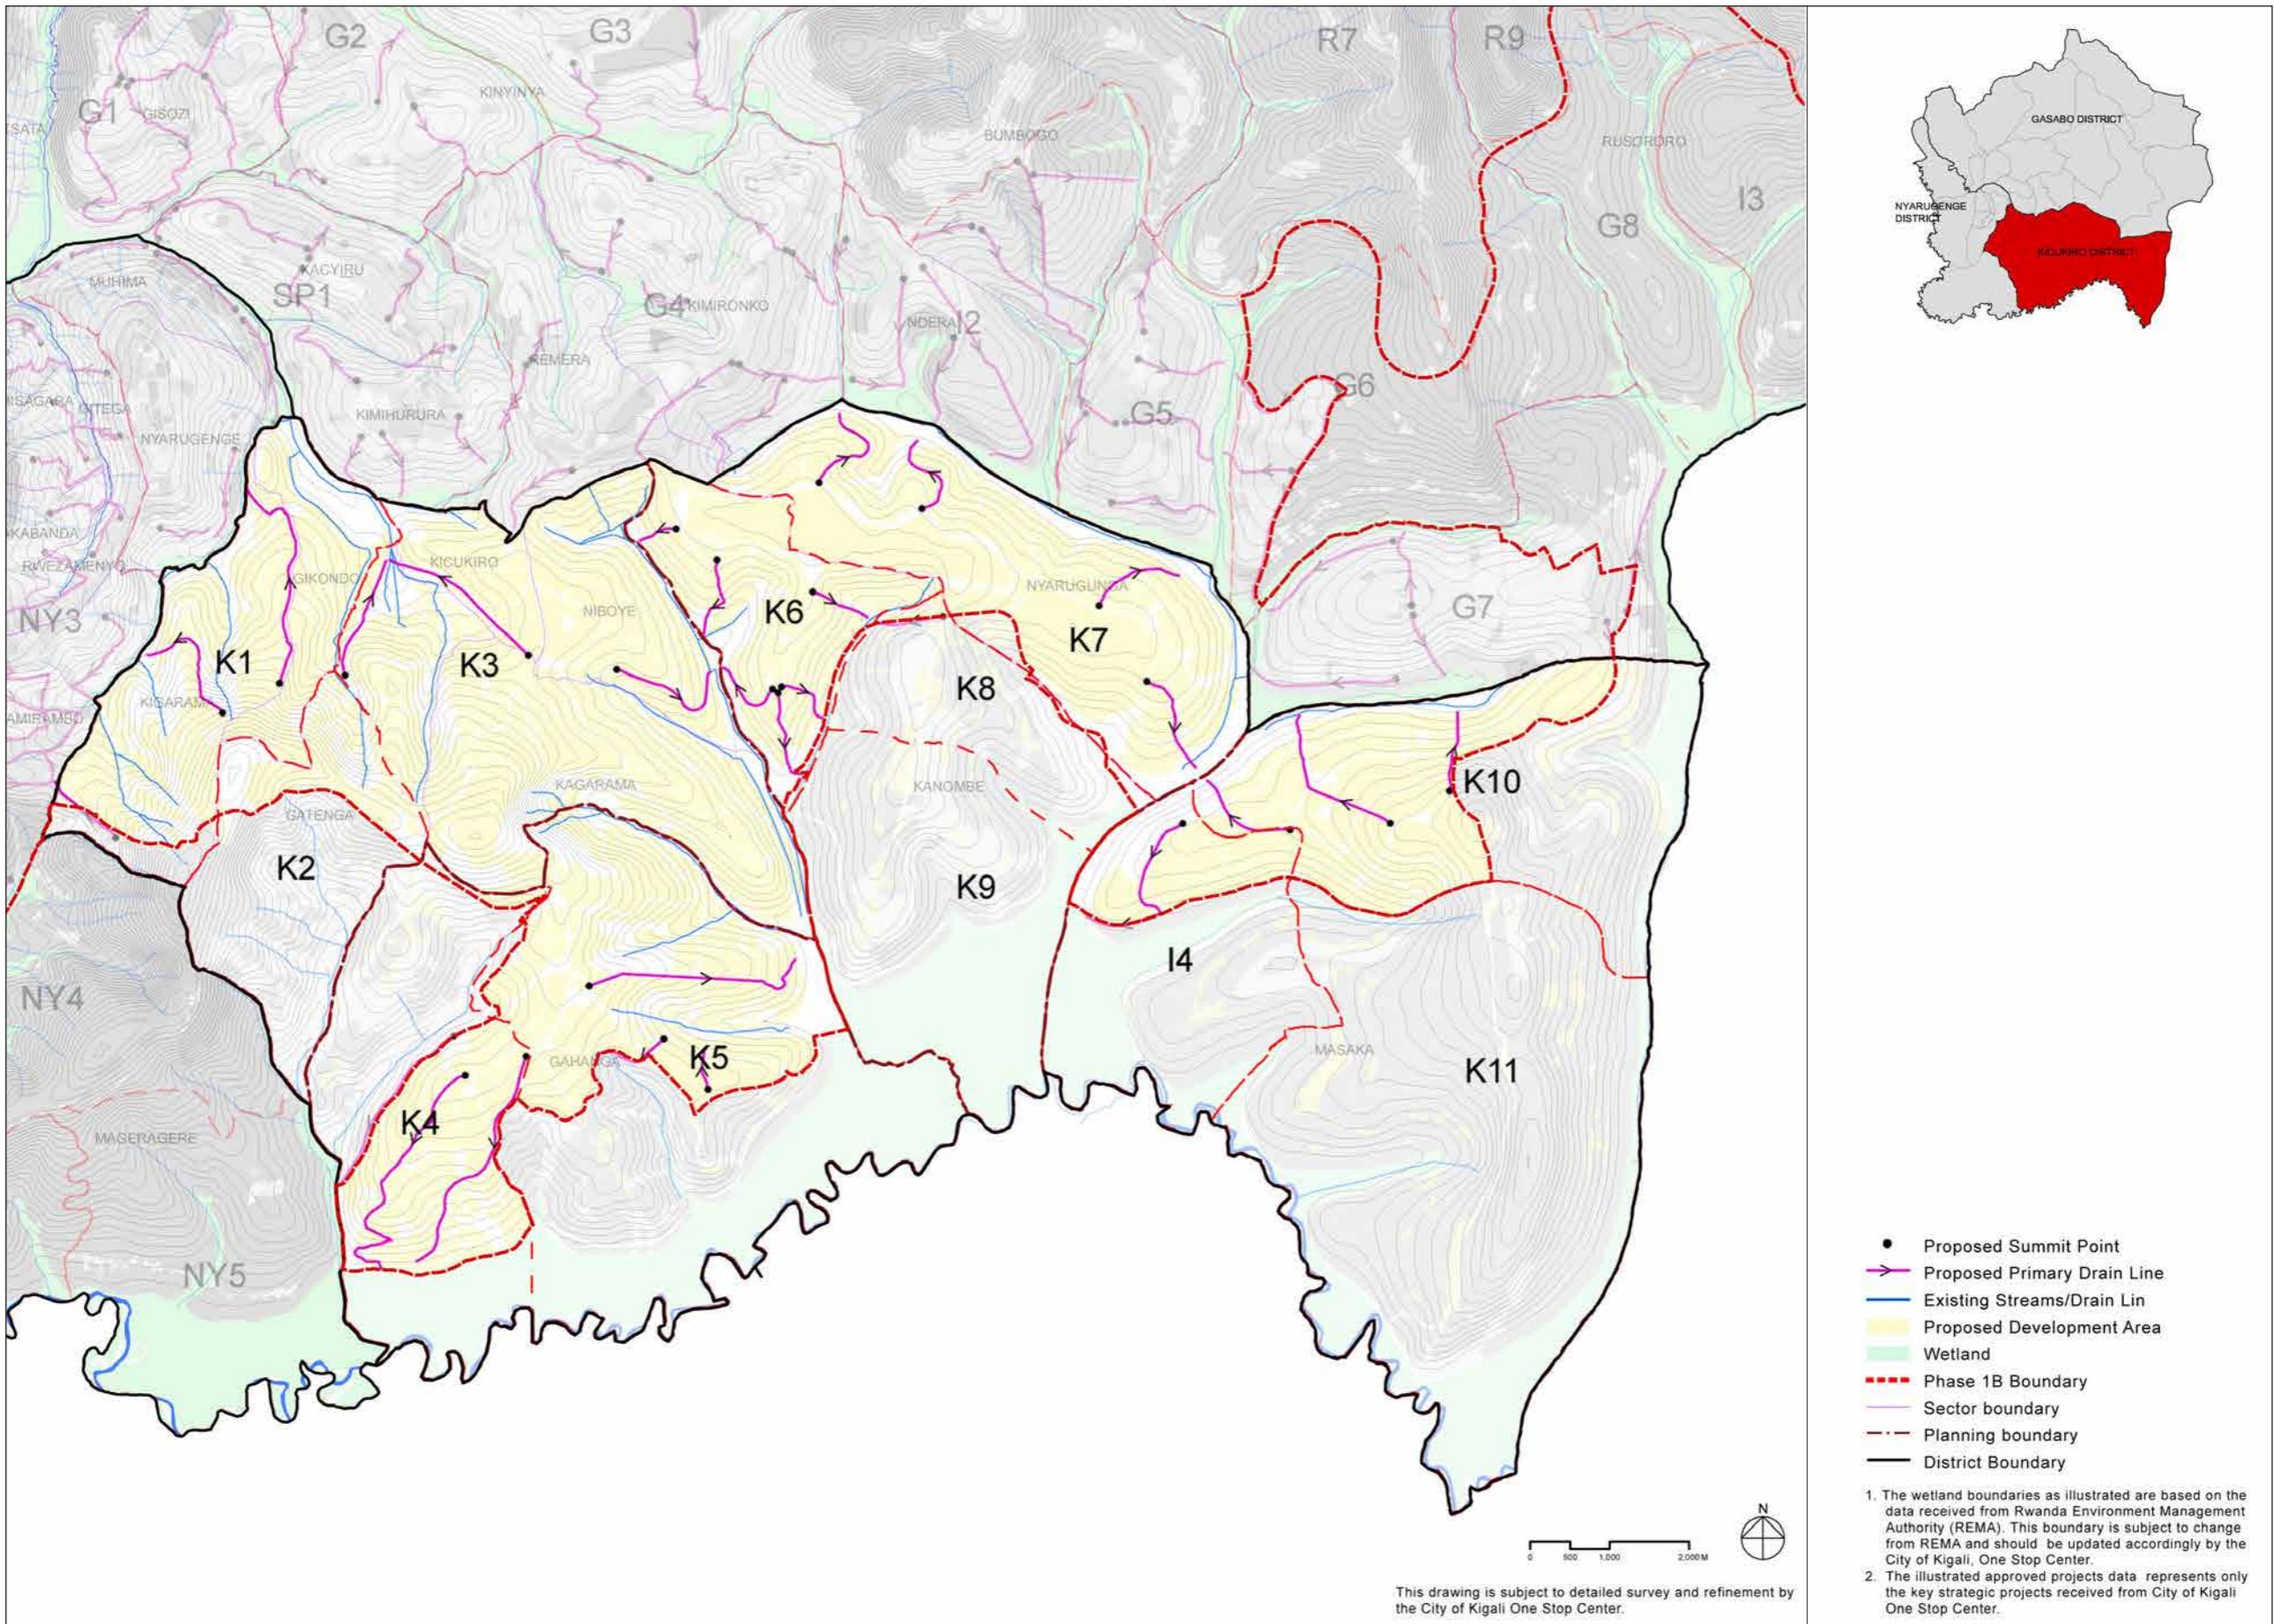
Kicukiro District - Proposed Drainage Plan - Year 2025
